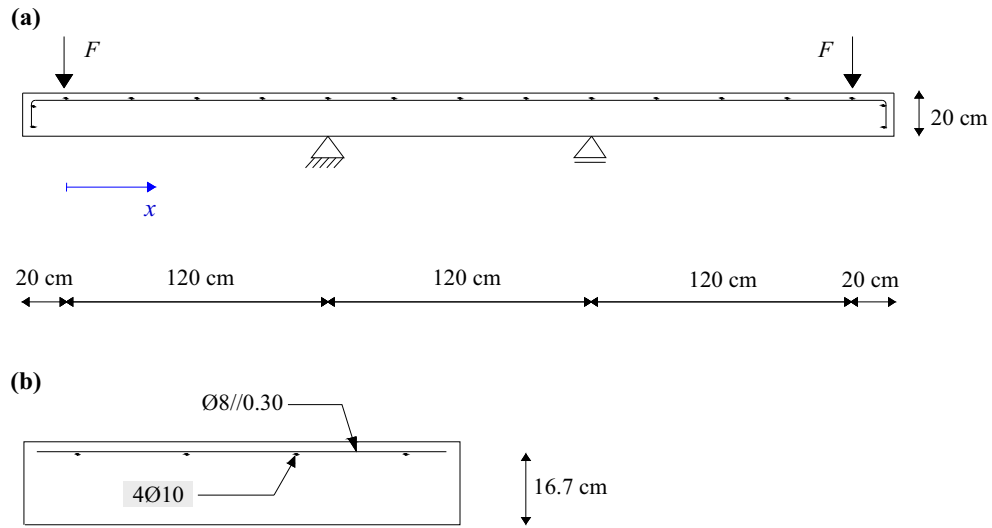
Test set-up of the bending test: (a) elevation, (b) cross-section.
